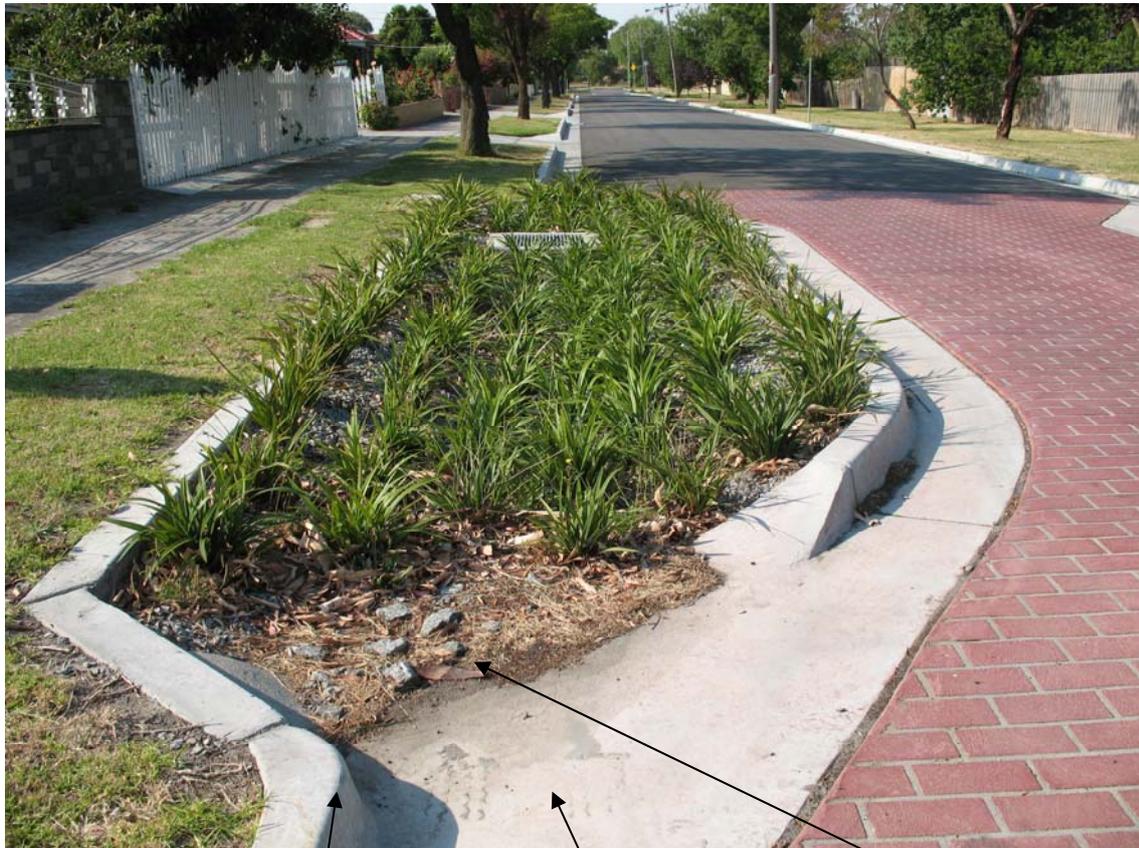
Kerb Inlet Design for a Bioretention Swale
